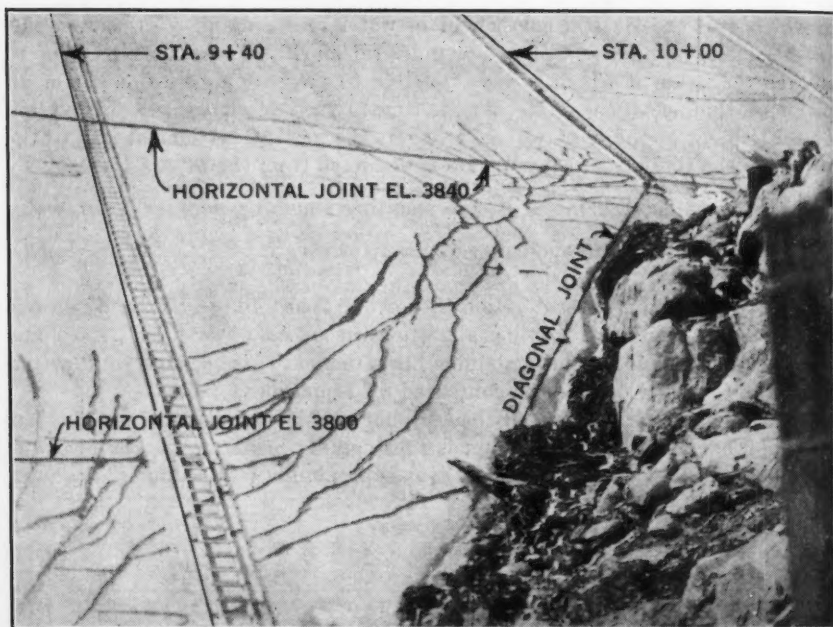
VIEW SHOWING CRACK REPAIRS IN CONCRETE FACE, SALT SPRINGS DAM
